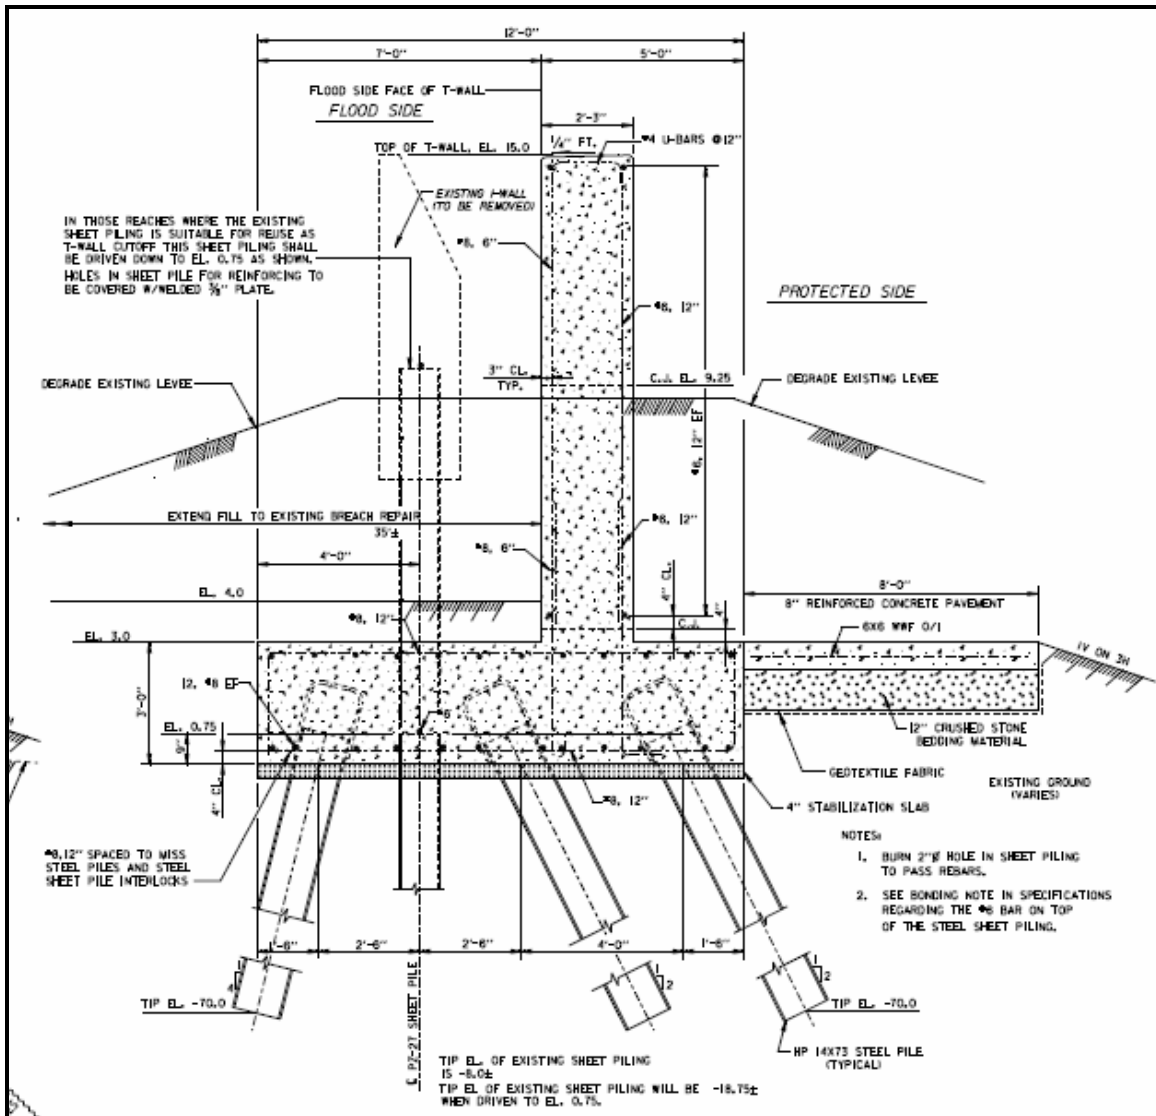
New T-wall Design Section (Reach STB2) (Pre-Katrina I-wall shown in picture for reference with authorized elevation of 15.0 feet)
